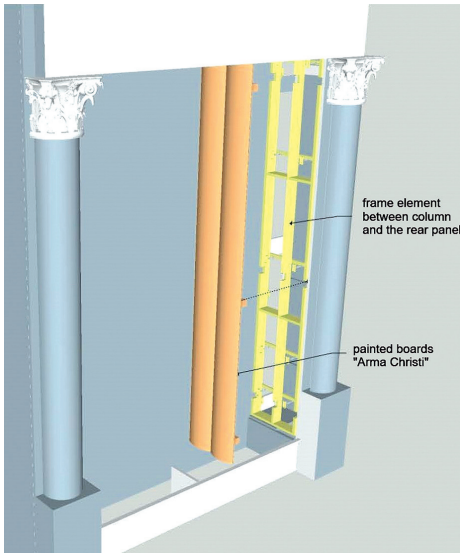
Schematic view (exploded-view drawing) of one part of the implemented system
